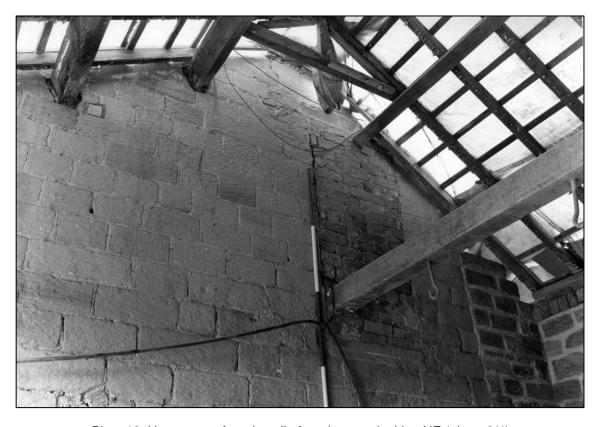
Upper part of north wall of north room, looking NE (photo 3/4).
